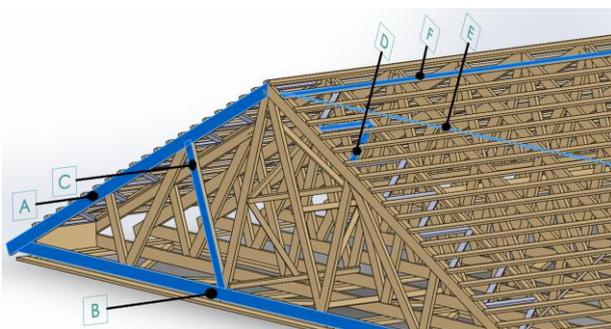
Pitched timber roof structure with semi-rigid bracing system of wood: A-top chord, B-bottom chord, C-diagonal, D-bracing truss, E-wind brace, F-roof battens.
